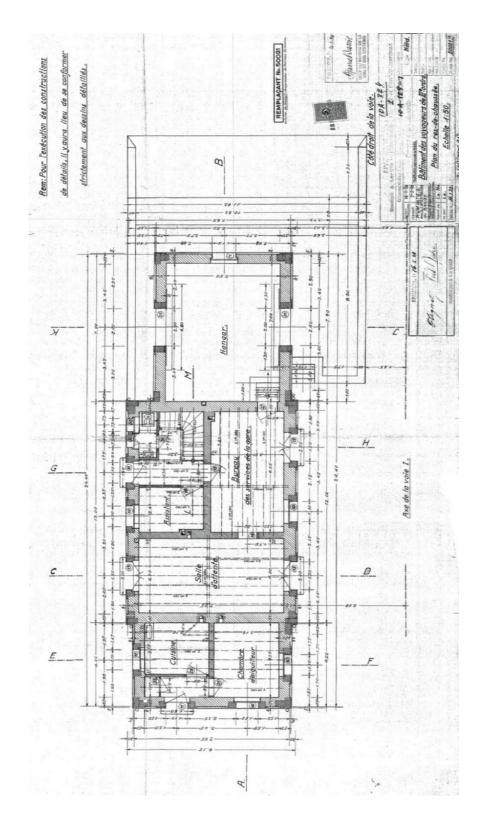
NYDQVIST-HOLM Company IIIrd Class project / Ground floor plan
